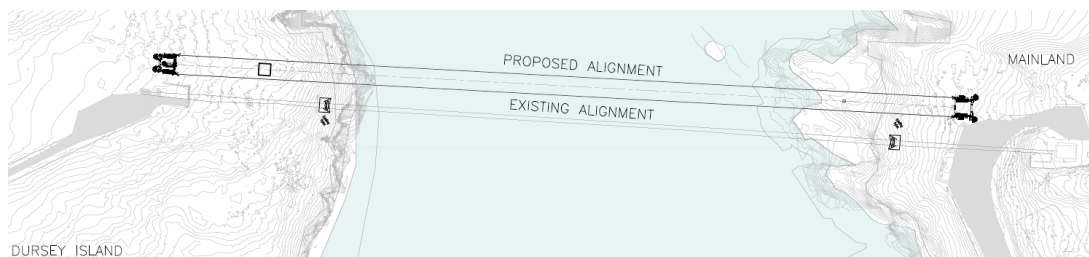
Map Illustrating Proposed Cableway Alignment
